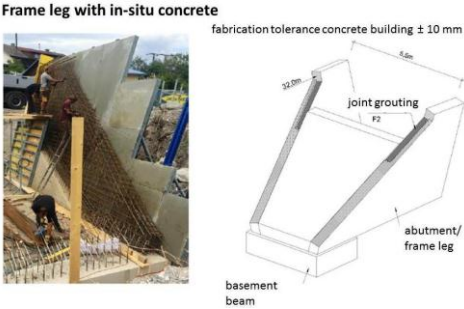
Fabrication and design of the frame leg with in-situ concrete
